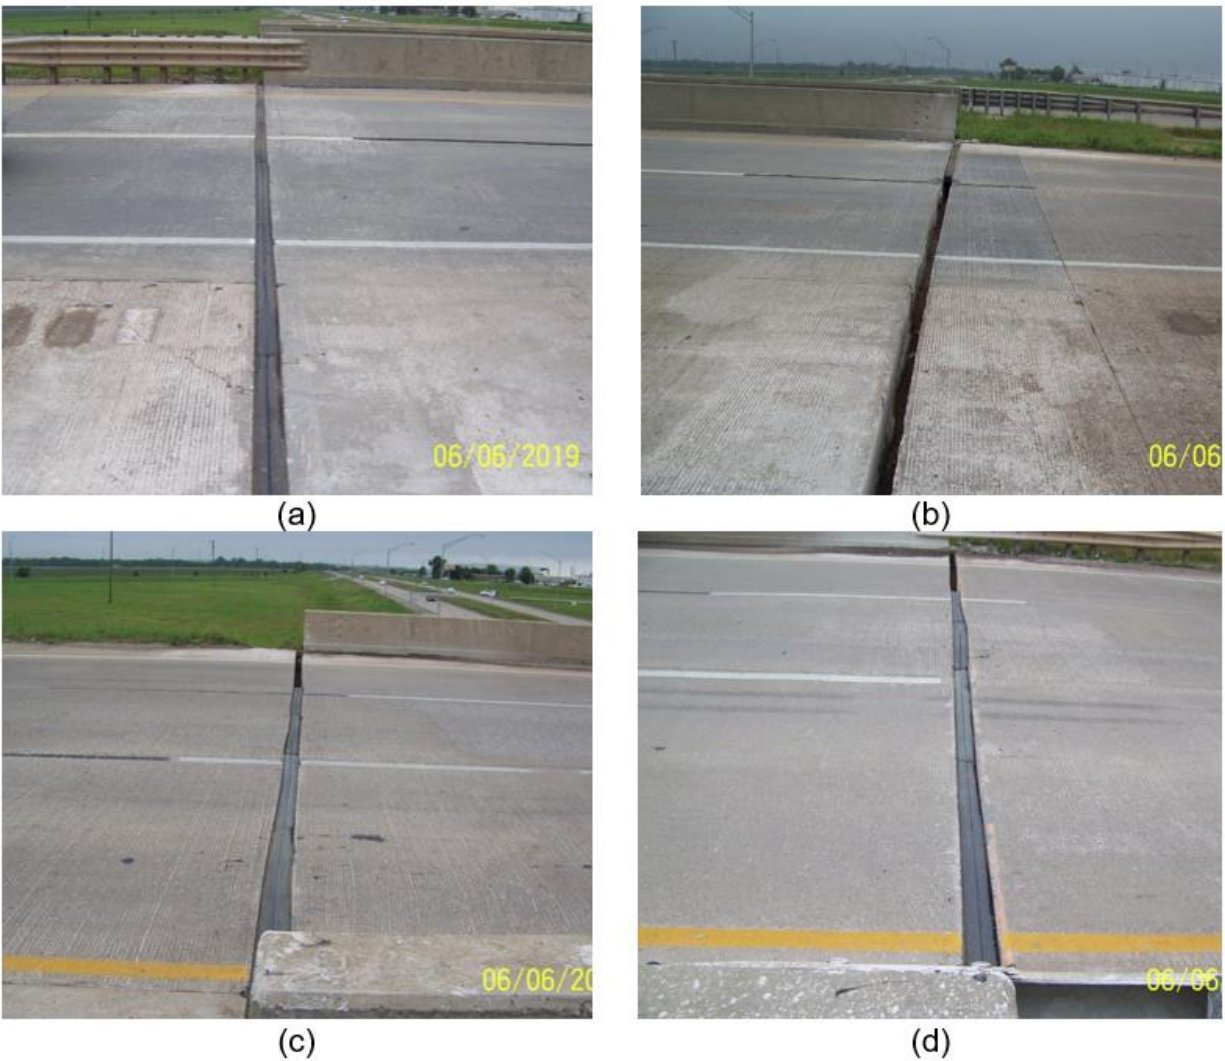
I-40 over SH-81 Joint Installation: (a) Westbound bridge – east approach, (b) Westbound bridge – west approach, (c) Eastbound bridge – east approach, (d) Eastbound bridge – west approach
